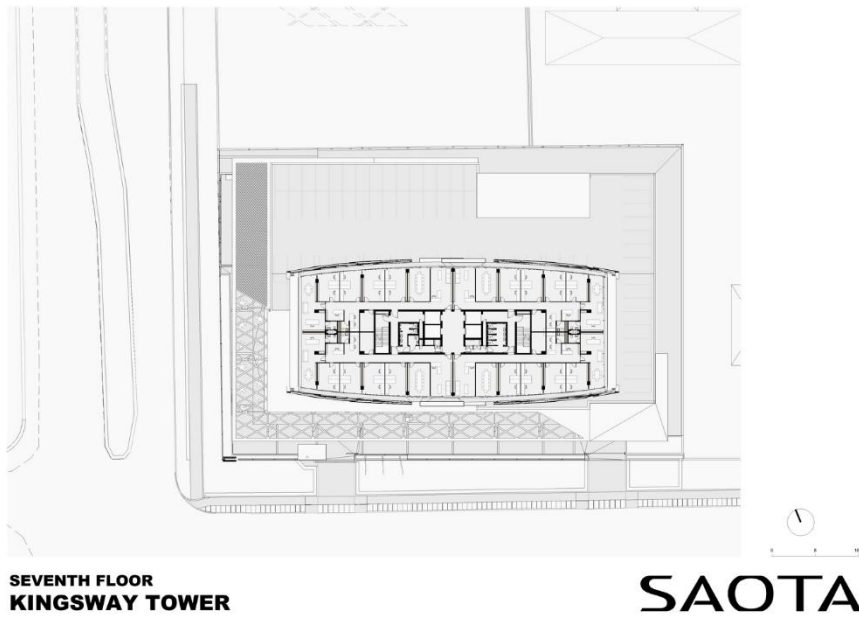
Seventh Floor Plan of Kings Tower Building
